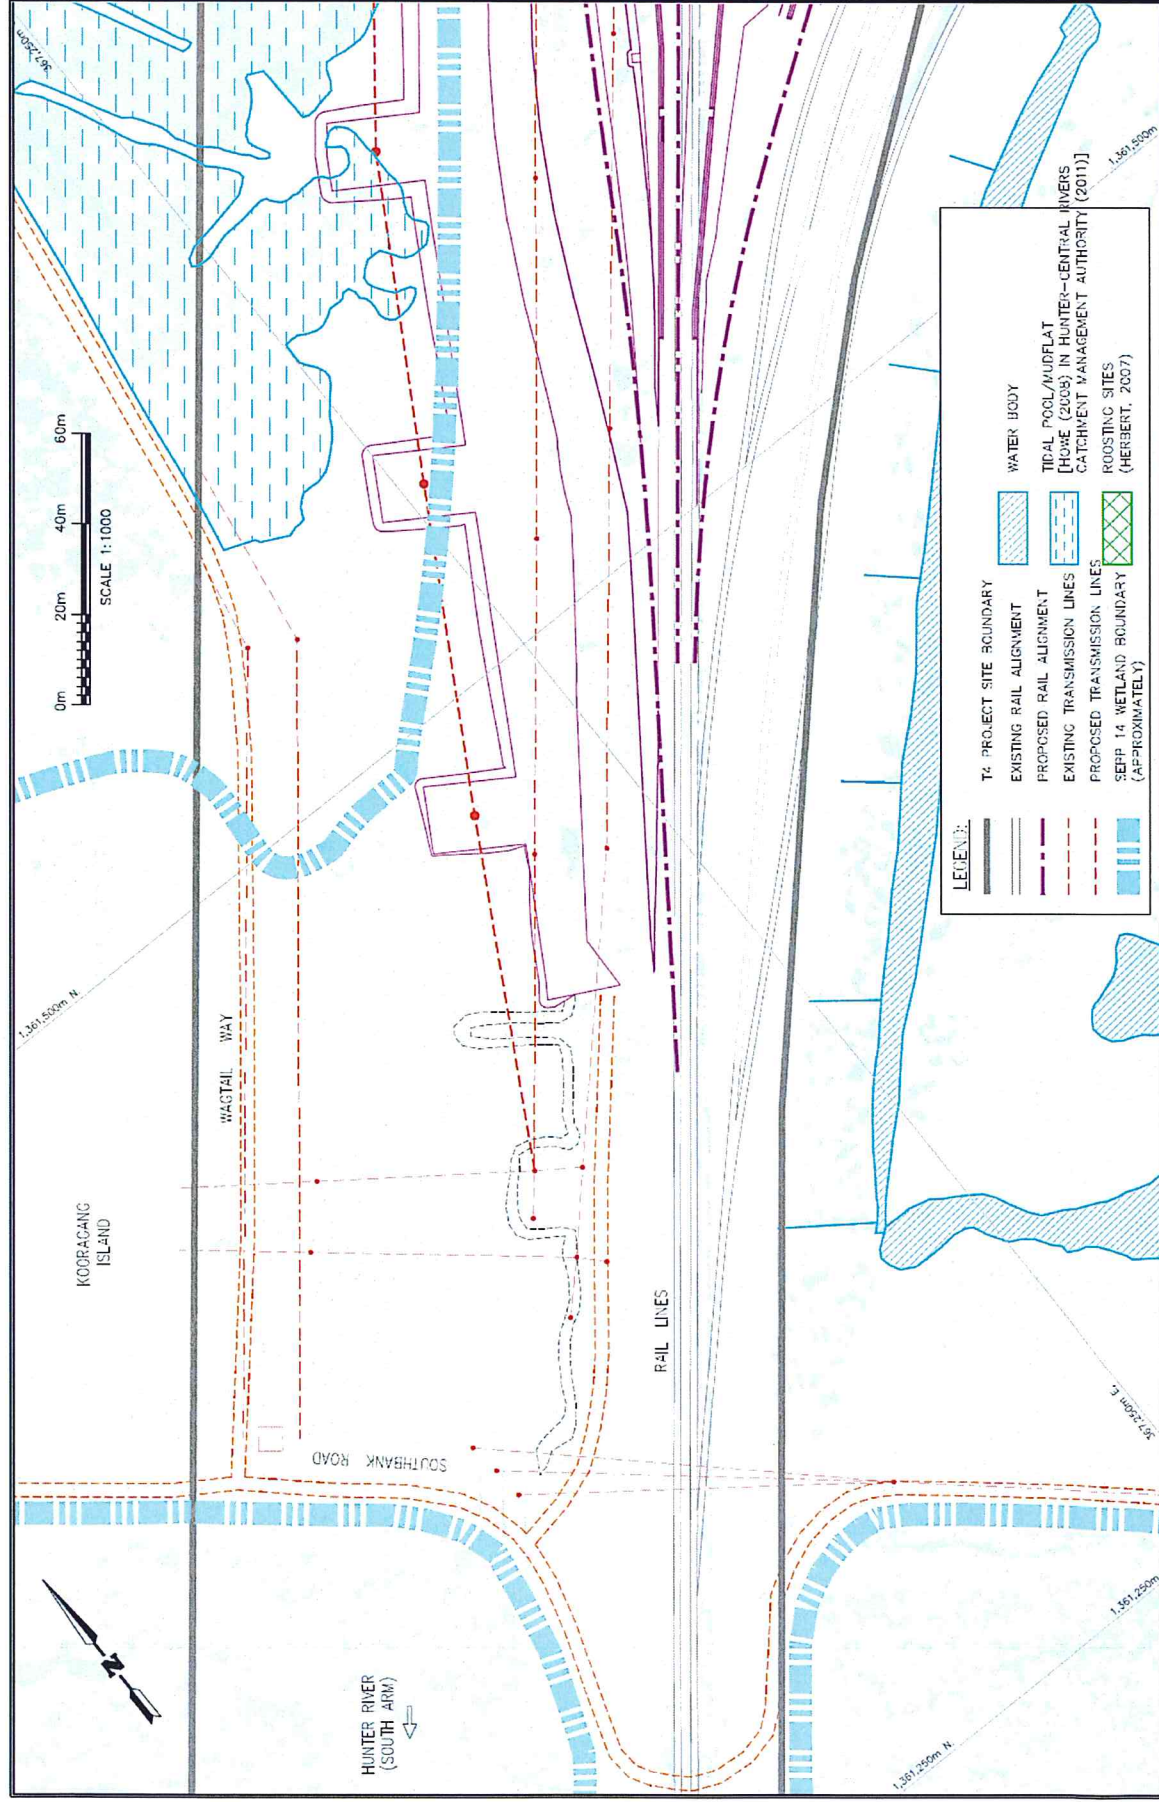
Proposed Rail Flyover (Plan 1 of 3)
